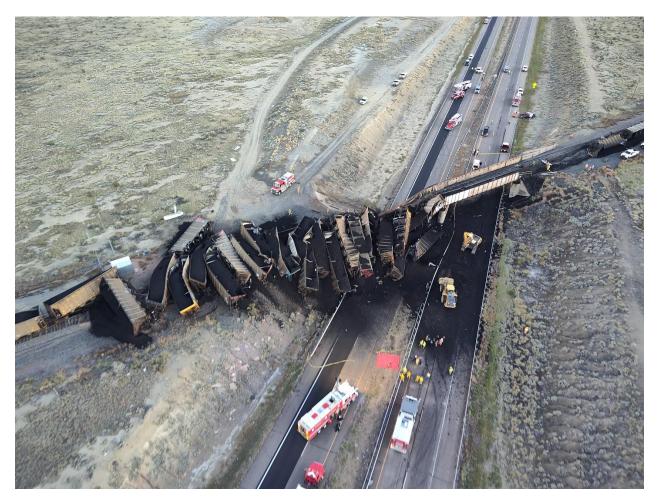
Aerial photo of the point of collision site. (source: BNSF Drone footage)
